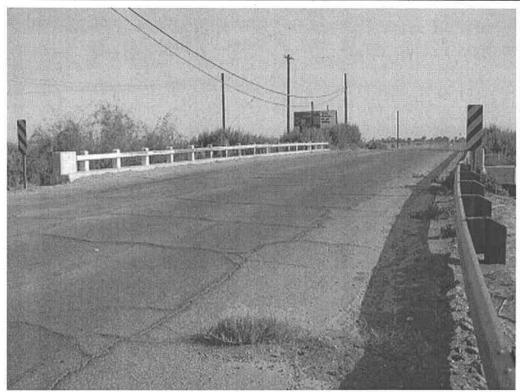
Scaroni Road bridge. Photograph was taken on the east side of the bridge, facing slightly northwest.
